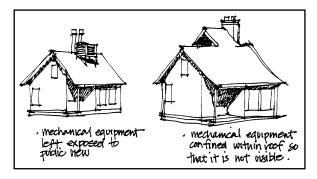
SCREENING OF ROOF-MOUNTED EQUIPMENT
